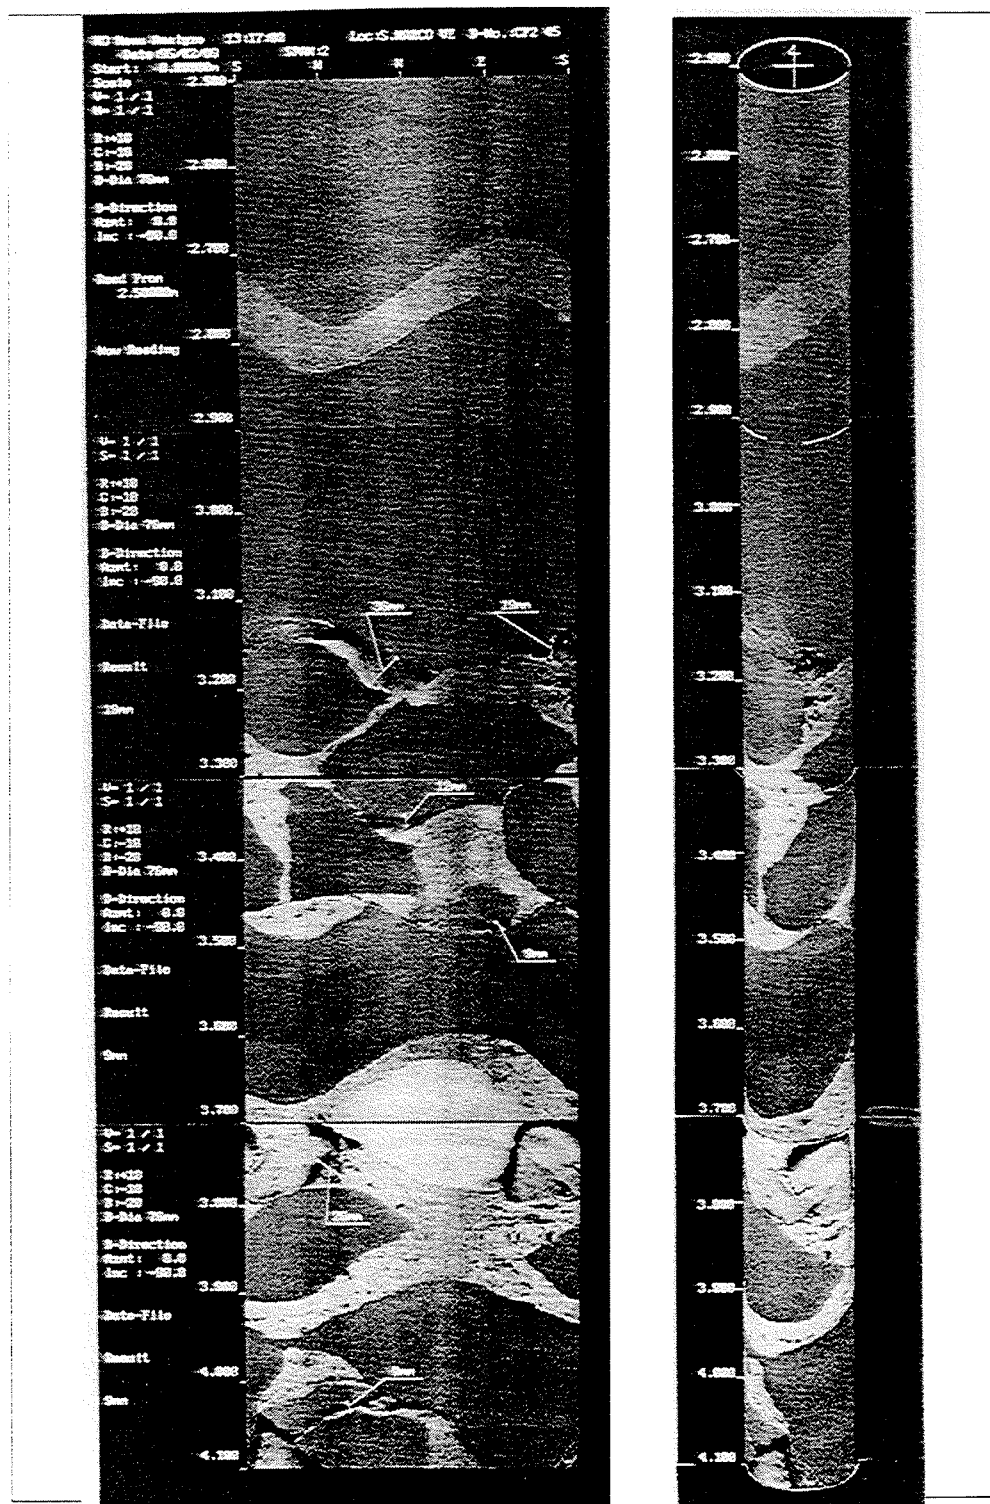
Video camera survey carried out on the foundation masonry of St. Mark's Bell Tower in Venice:
